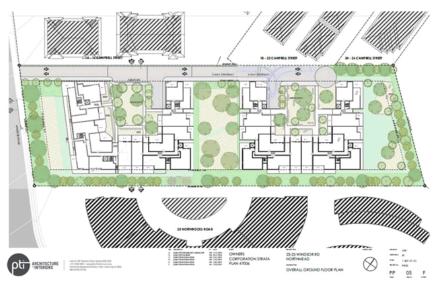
Vehicle access plan for subject site (Source: PTI Architecture)
